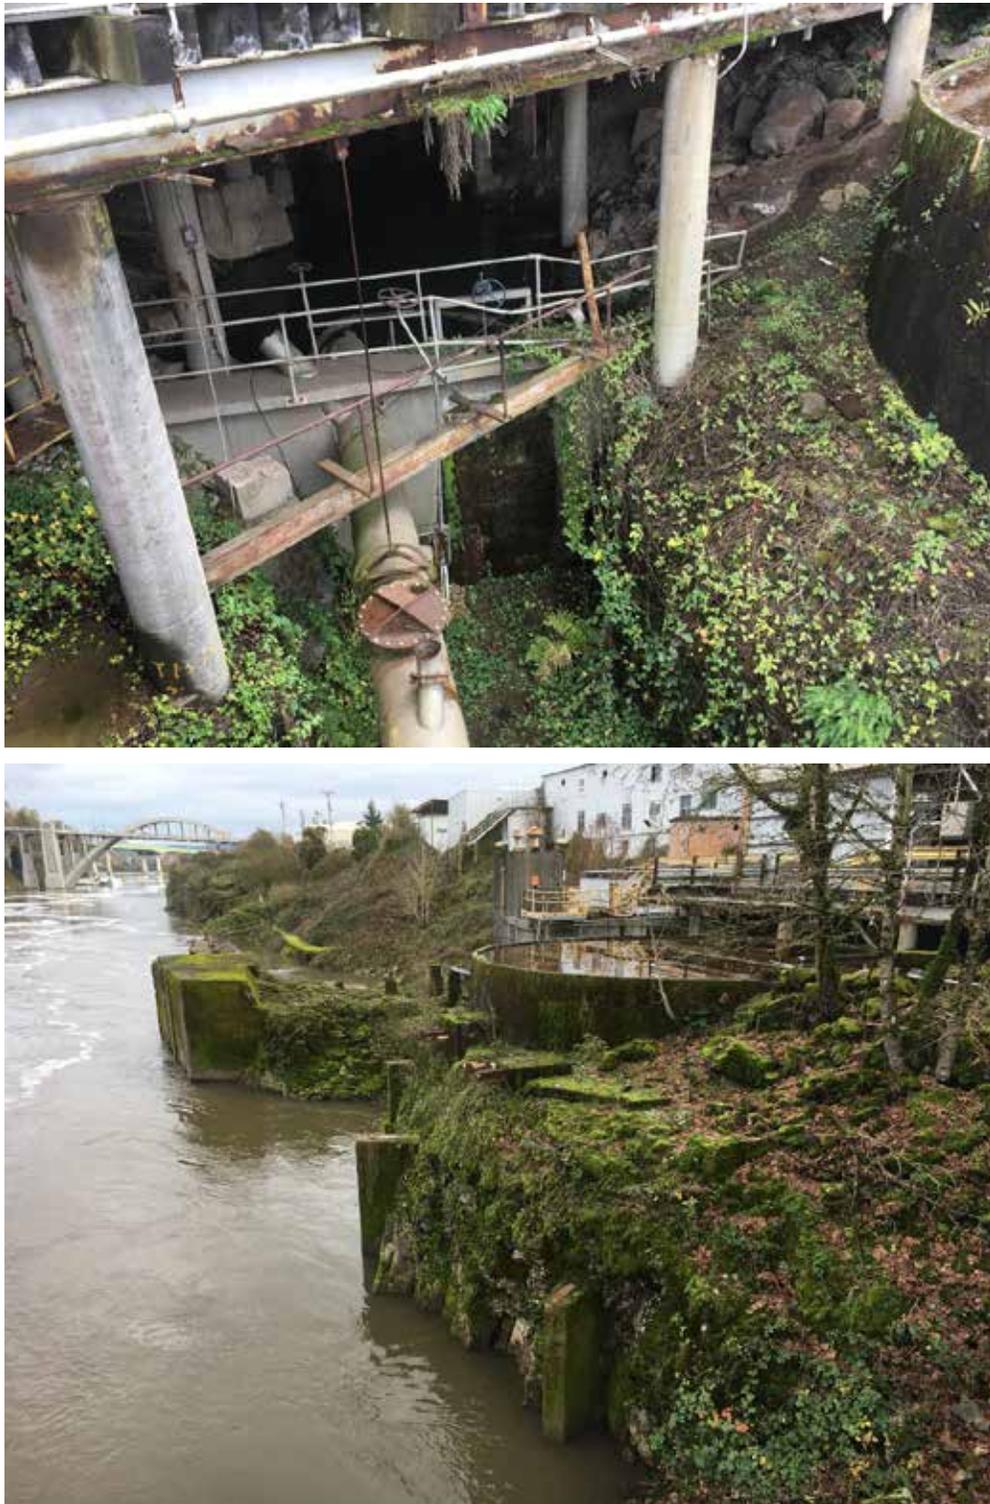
Photographic views of basalt outcrops and rock debris located near the millrace outlet beneath No. 3 Paper Machine Building #2 (top) and the Circular Tank Foundation 1 (bottom).
